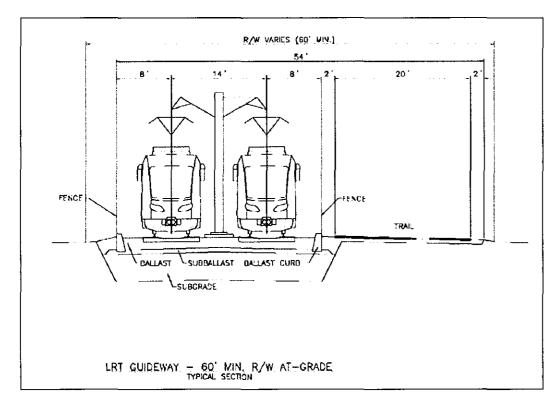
A section showing the guideway adjacent to a bike / walking trail (from the DEIS).
